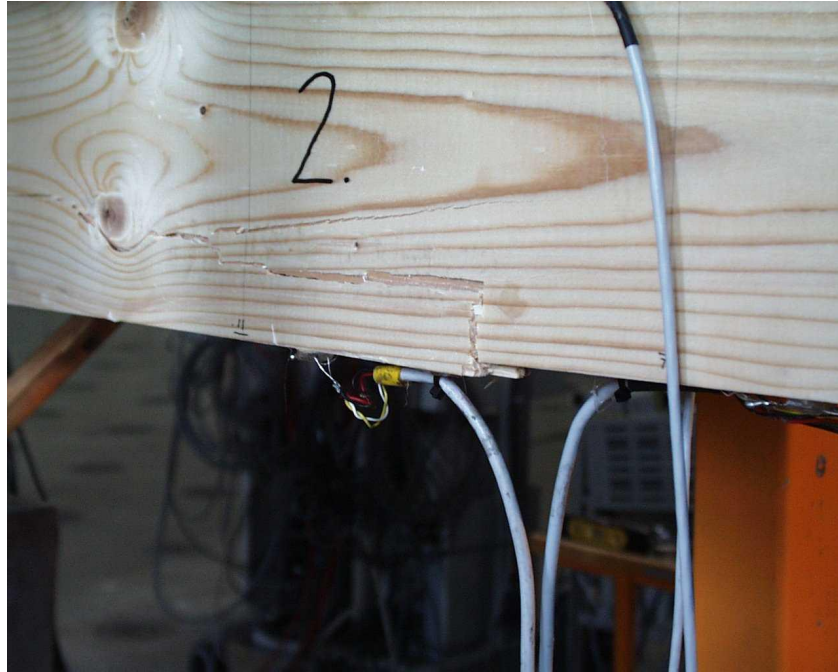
Failure pattern of Specimen 2. Photo: L. Salokangas.
